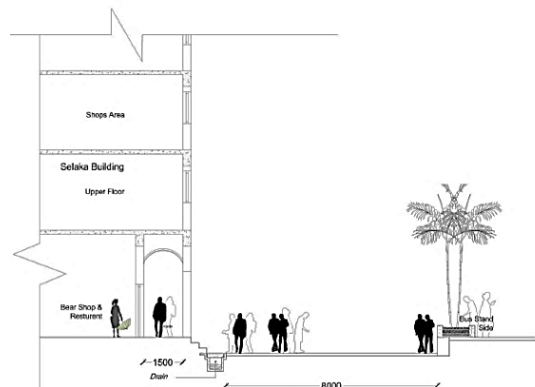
a: Proposed walkway at canal bank at Havelock Road
